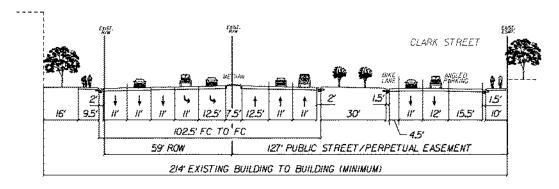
Existing Route 1 Cross Section Between 23rd Street S and 20th Street S Cross Section (looking north)
